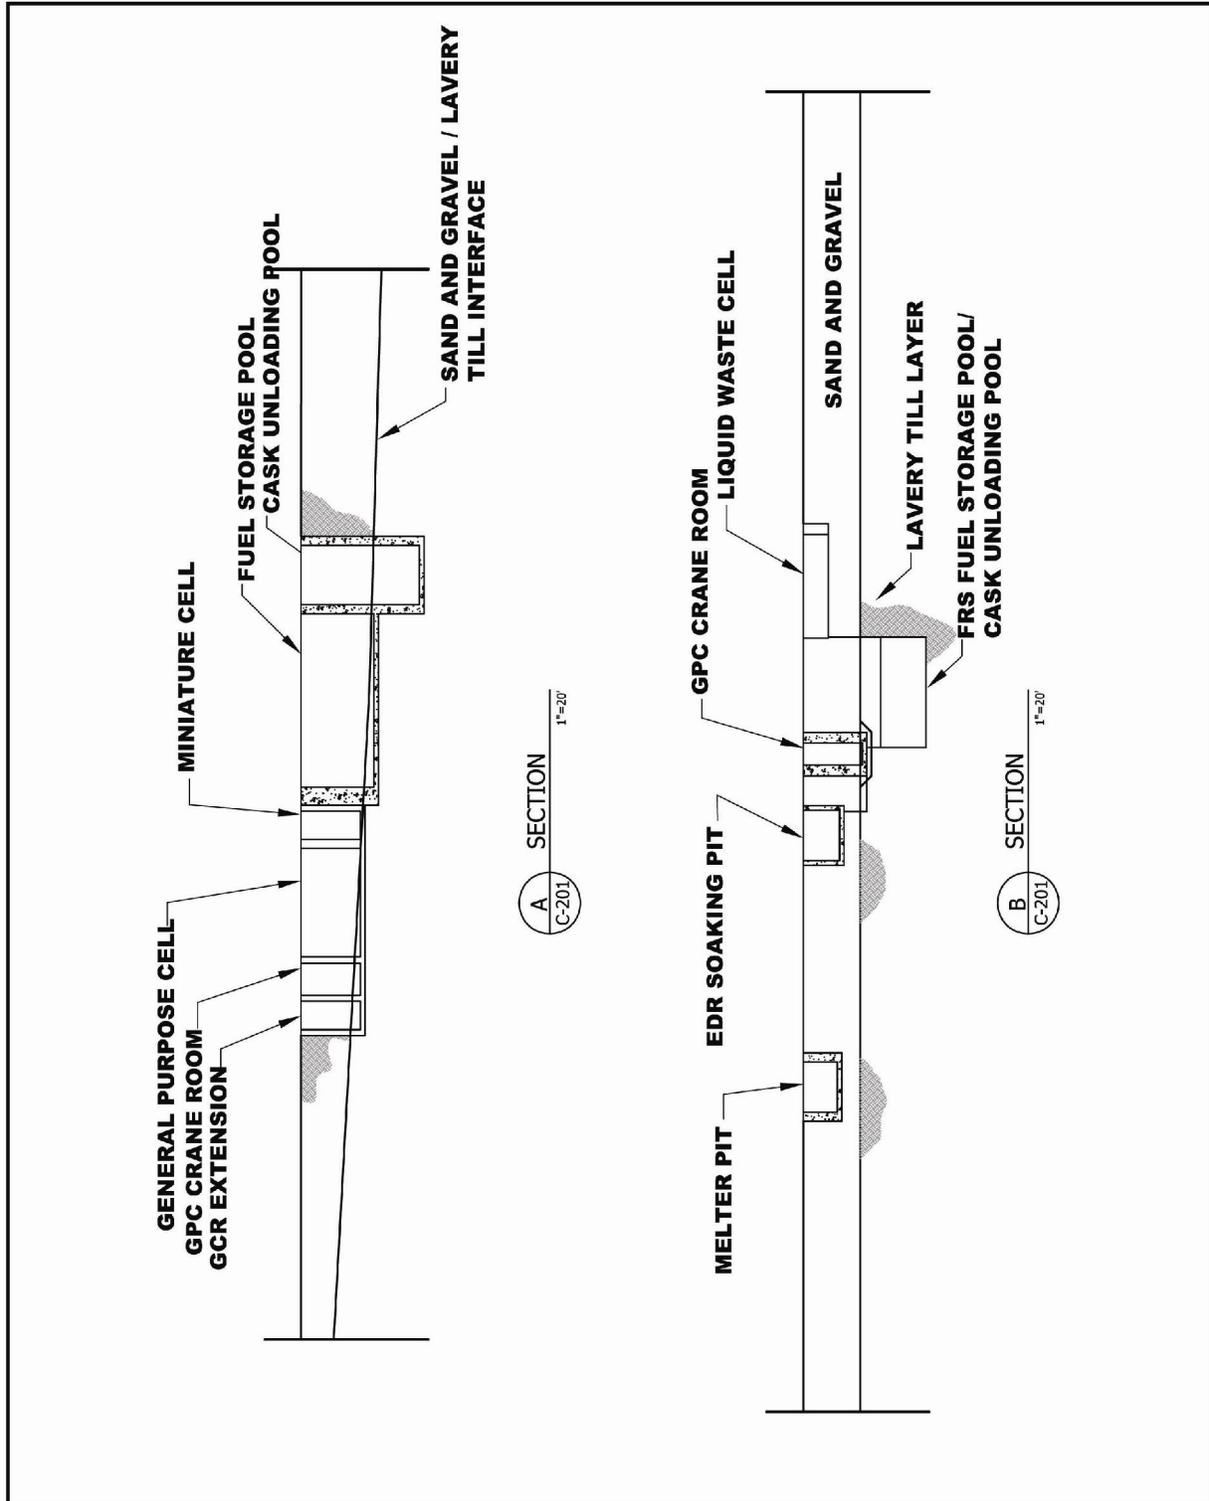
Main Plant Process Building Subgrade Facility Sections
